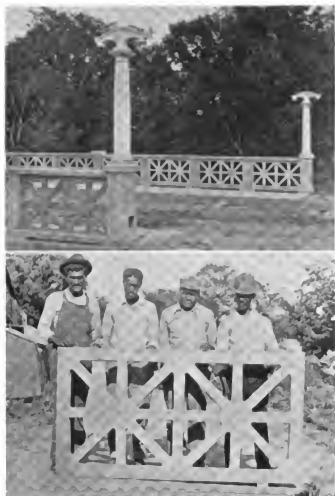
THE UPPER VIEW SHOWS AN APPROACH OF THE FINISHED BRIDGE. BELOW IS SHOWN A FINISHED PANEL OF THE RAILING.
